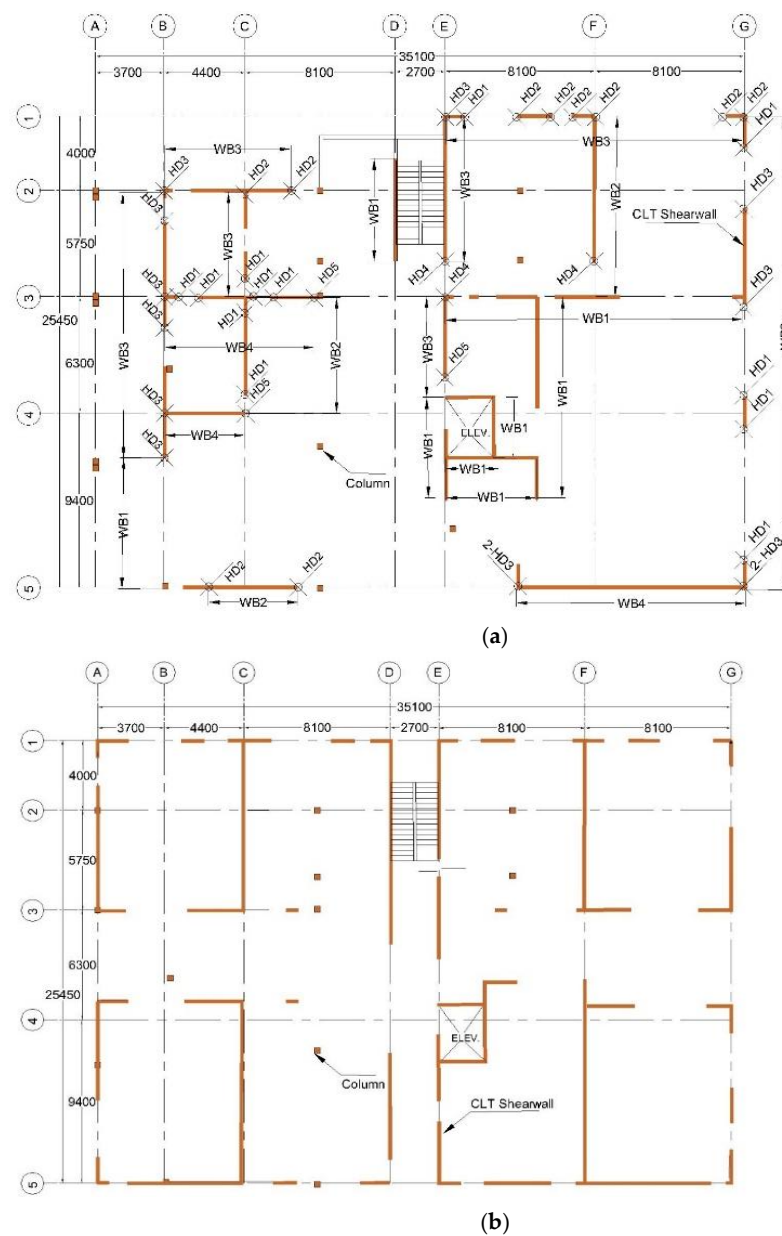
Plan view of northern block of building: (a) first floor, and (b) second floor (unit: mm).
